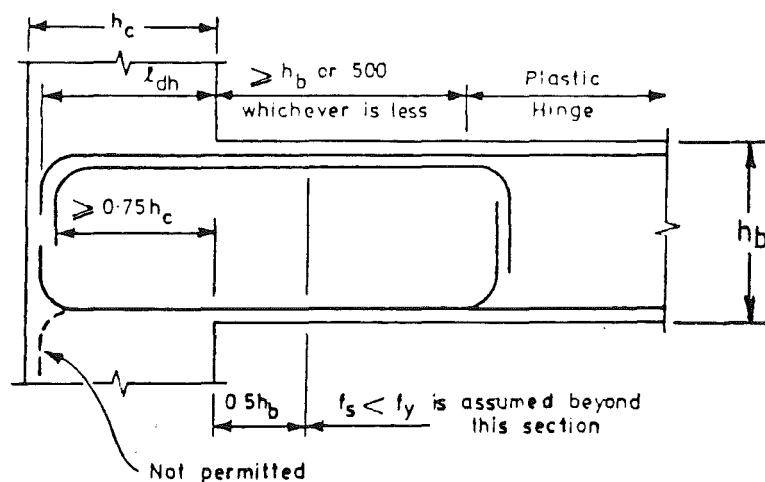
Anchorage of beam bars when critical section of plastic hinge is located at sufficient distance from column face [4]
